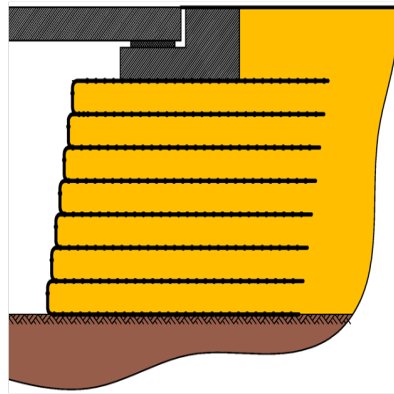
Sketch showing a geotextile reinforced earth structure as directly loaded bridge abutment
